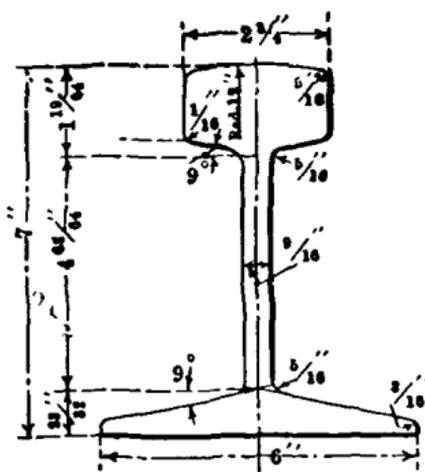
Am. El. Ry. Eng. Assn. 91-lb., 7-in. T-rail.
